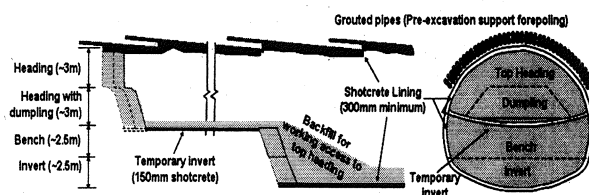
Sequential Excavation and Support Schematic for SCL tunnel construction
